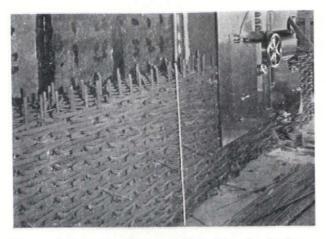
Reinforcing Frames of Bent Bars At Angles to Face of Wall
